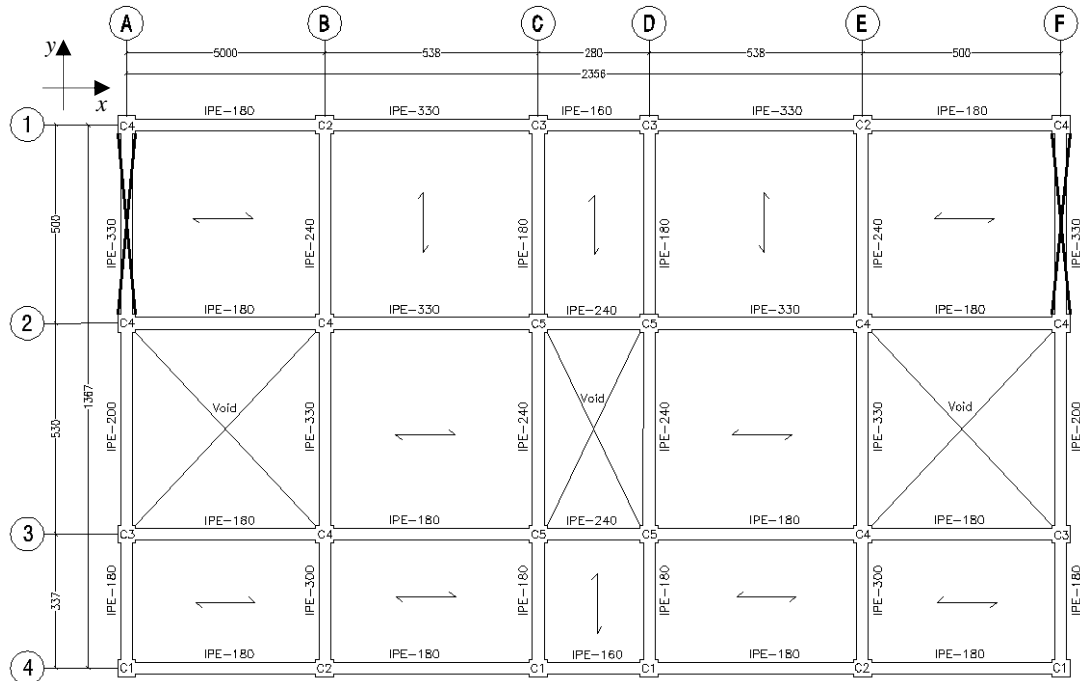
2<sup>nd</sup>, 3<sup>rd</sup> and 4<sup>th</sup> floor plans of the index building (units in centimetre)
